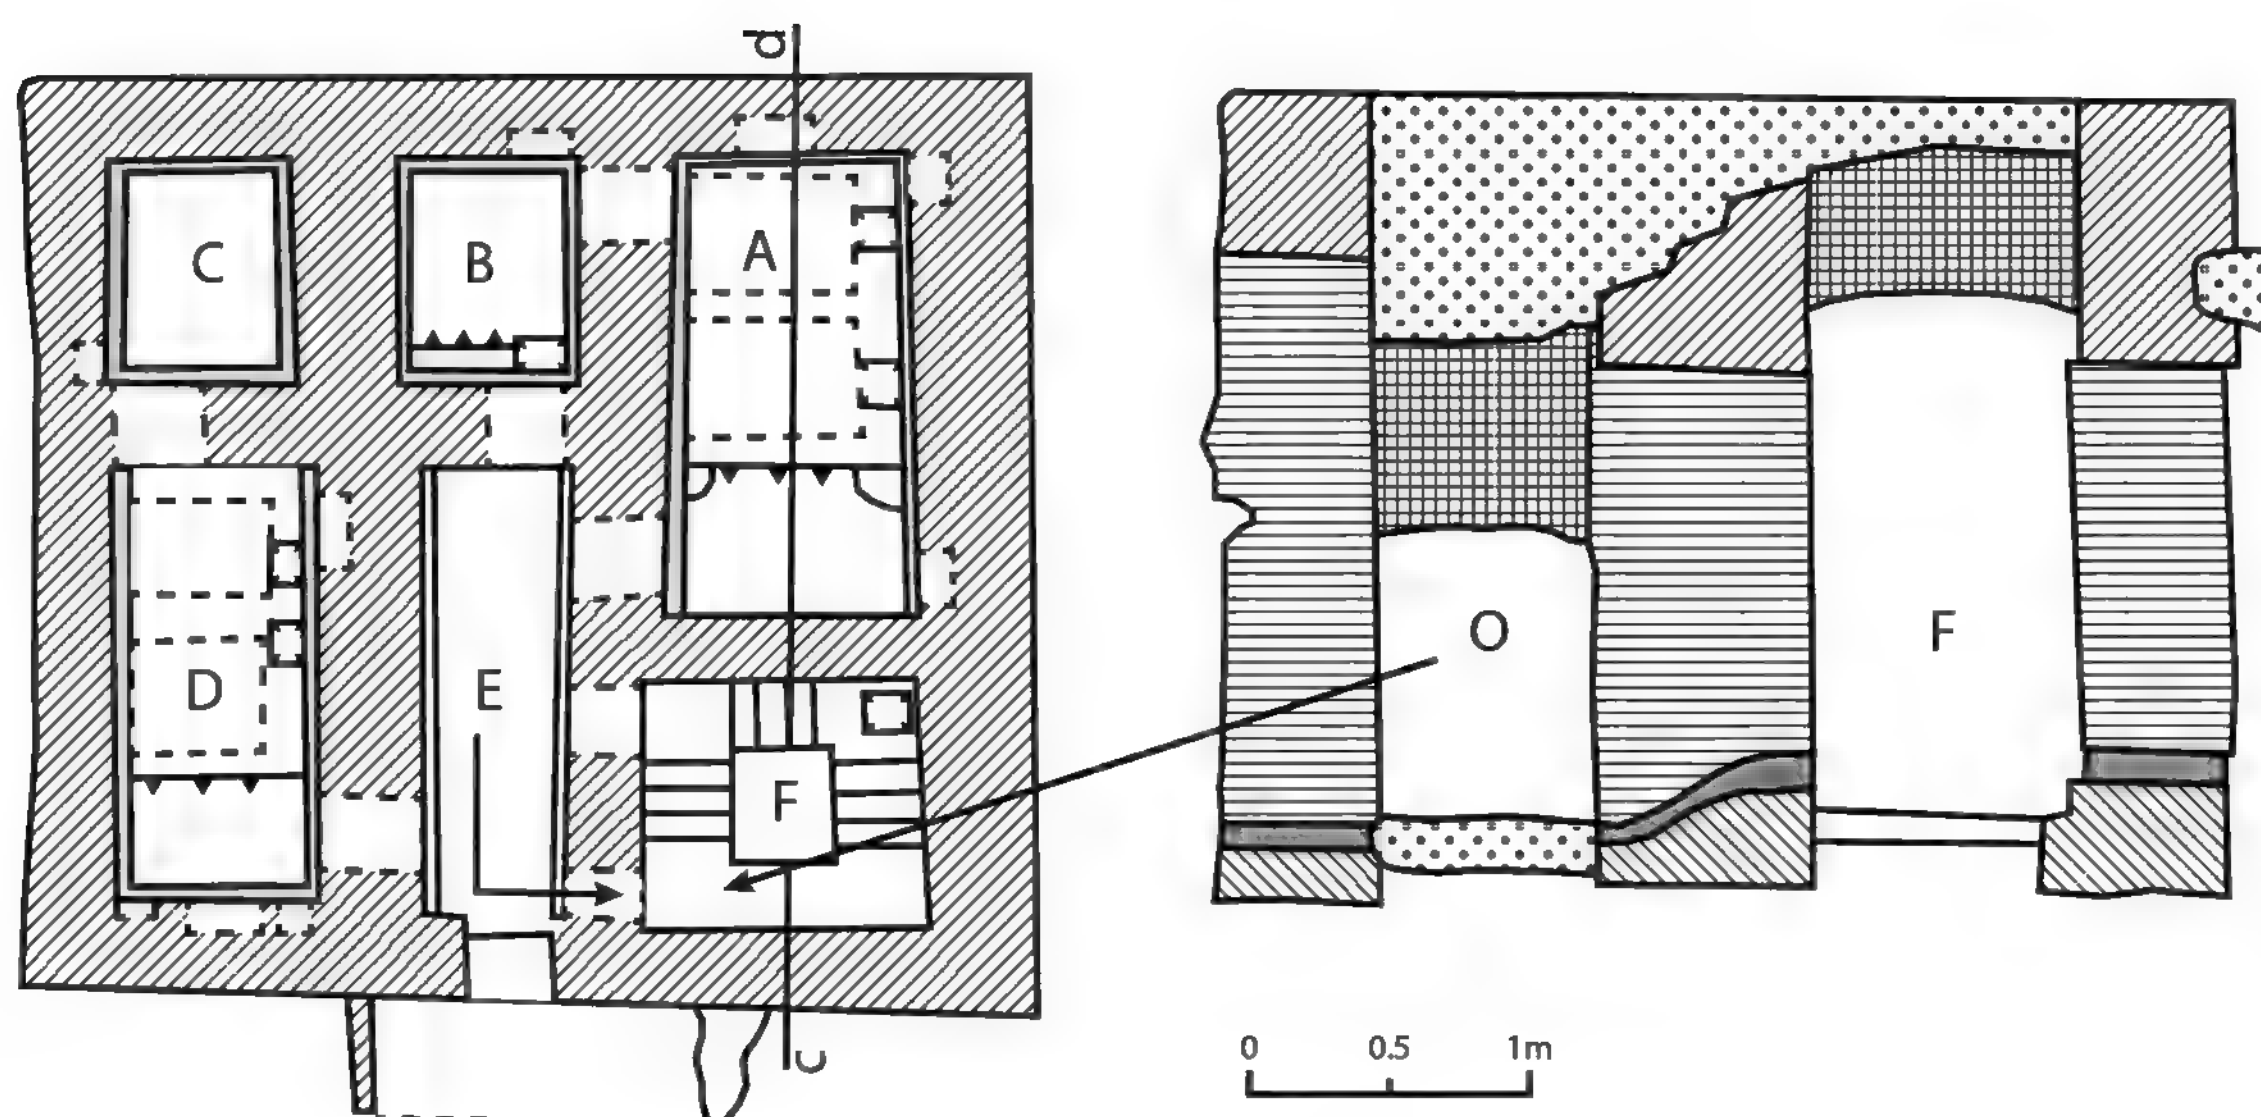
Bakchias, house VIII. Plan and section c–d. The arrow in the plan shows the access from room E to the room under the staircase O. On the right a section of the room O and the staircase F.
